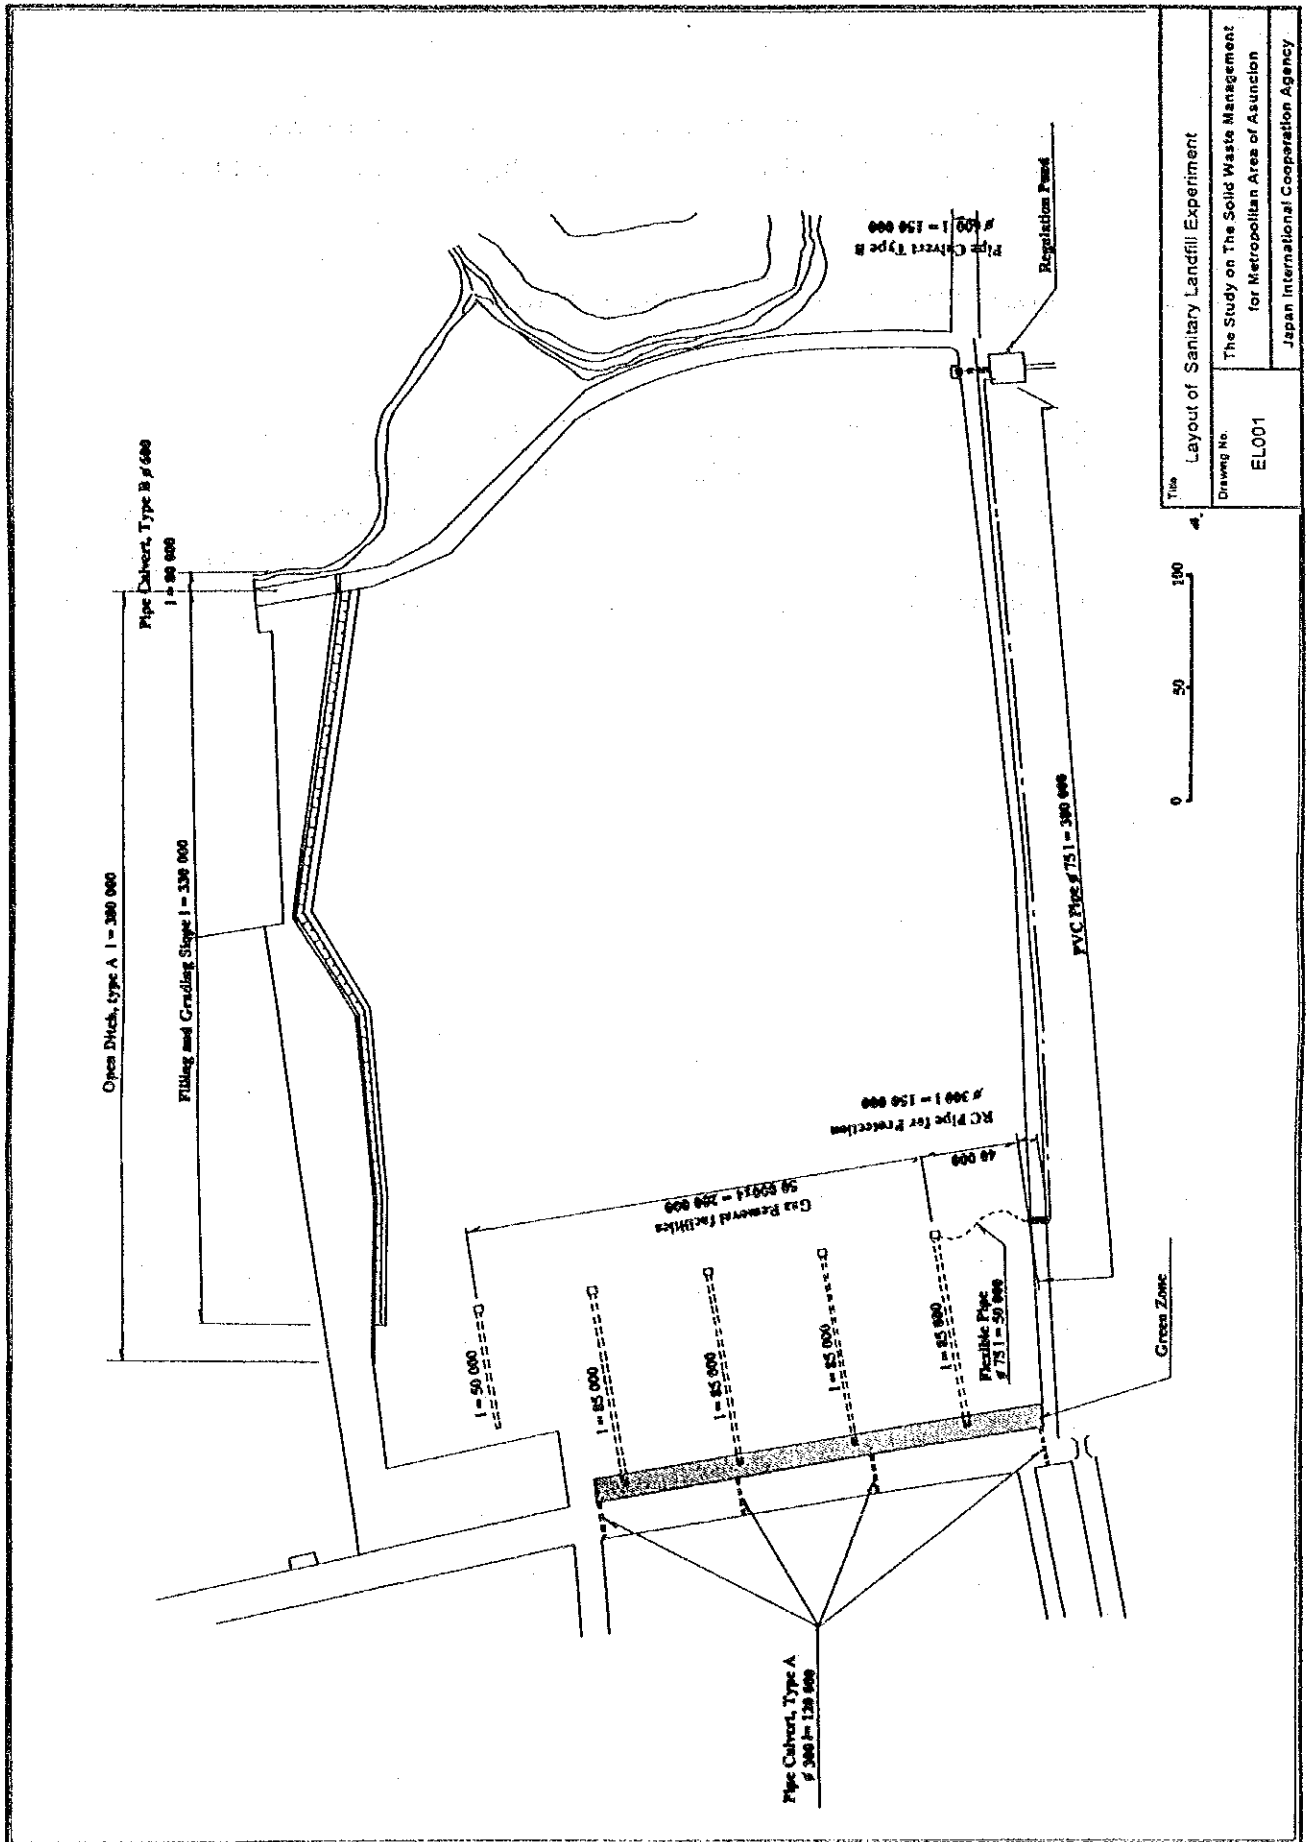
Proposed Plan of the Sanitary Landfill Experiment
